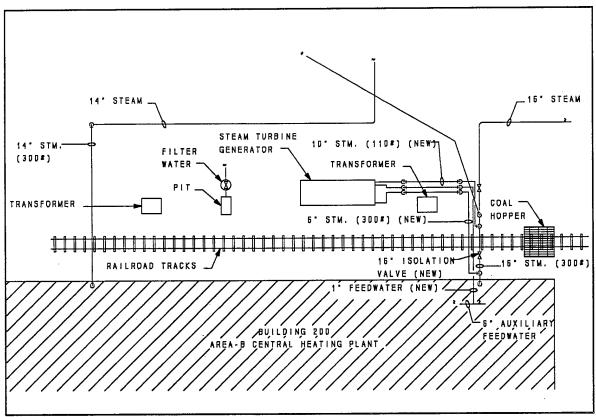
STEAM TURBINE-GENERATOR PLANT SITE
